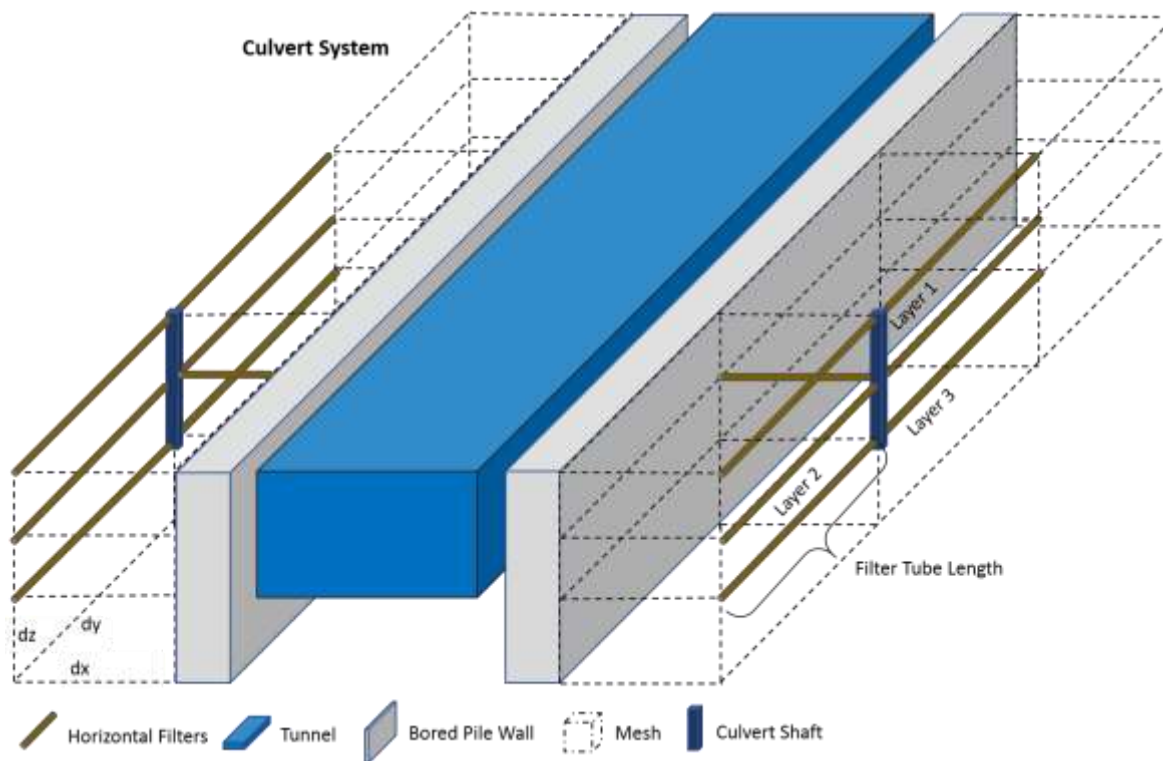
Numerical model of the tunnel motorways and the culvert system.
